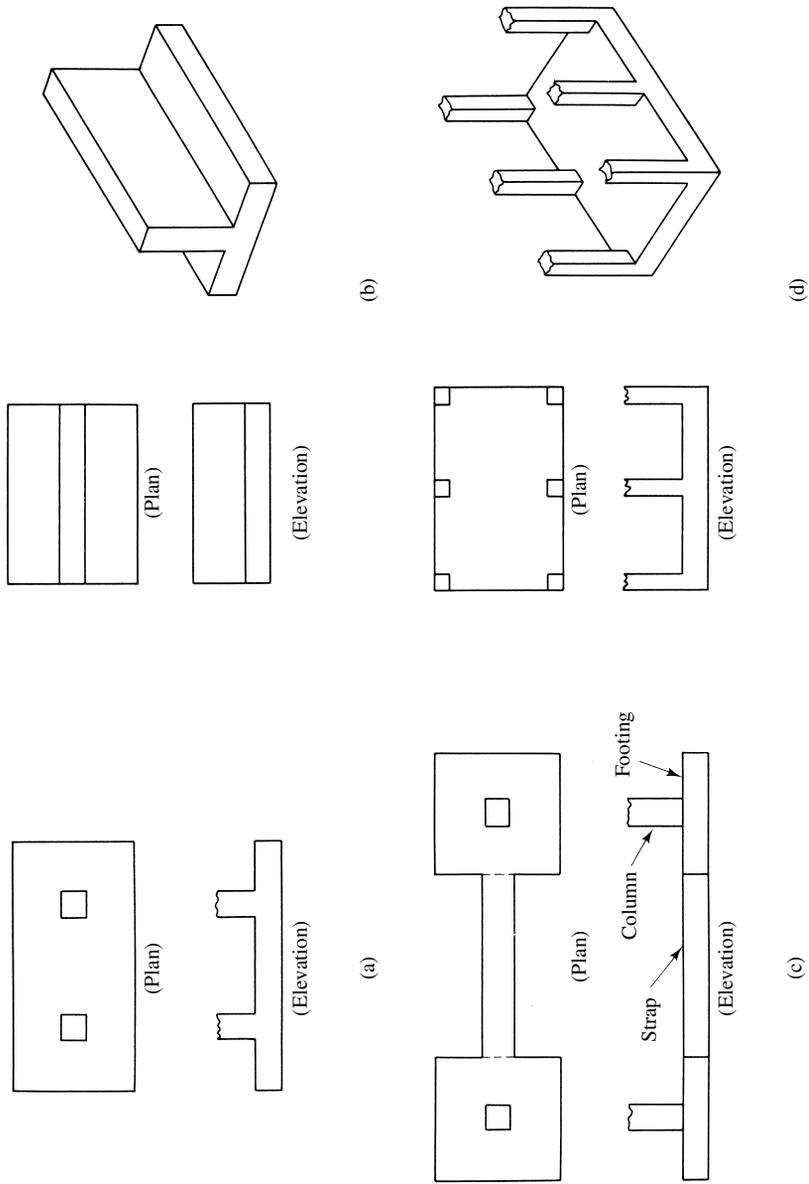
Classification of footings: (a) combined footing; (b) wall footing; (c) strap footing; (d) mat or raft foundation.
